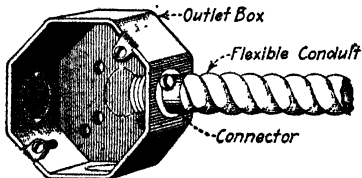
Third step, connector inserted into box hole with shoulder of connector bearing against box side.
